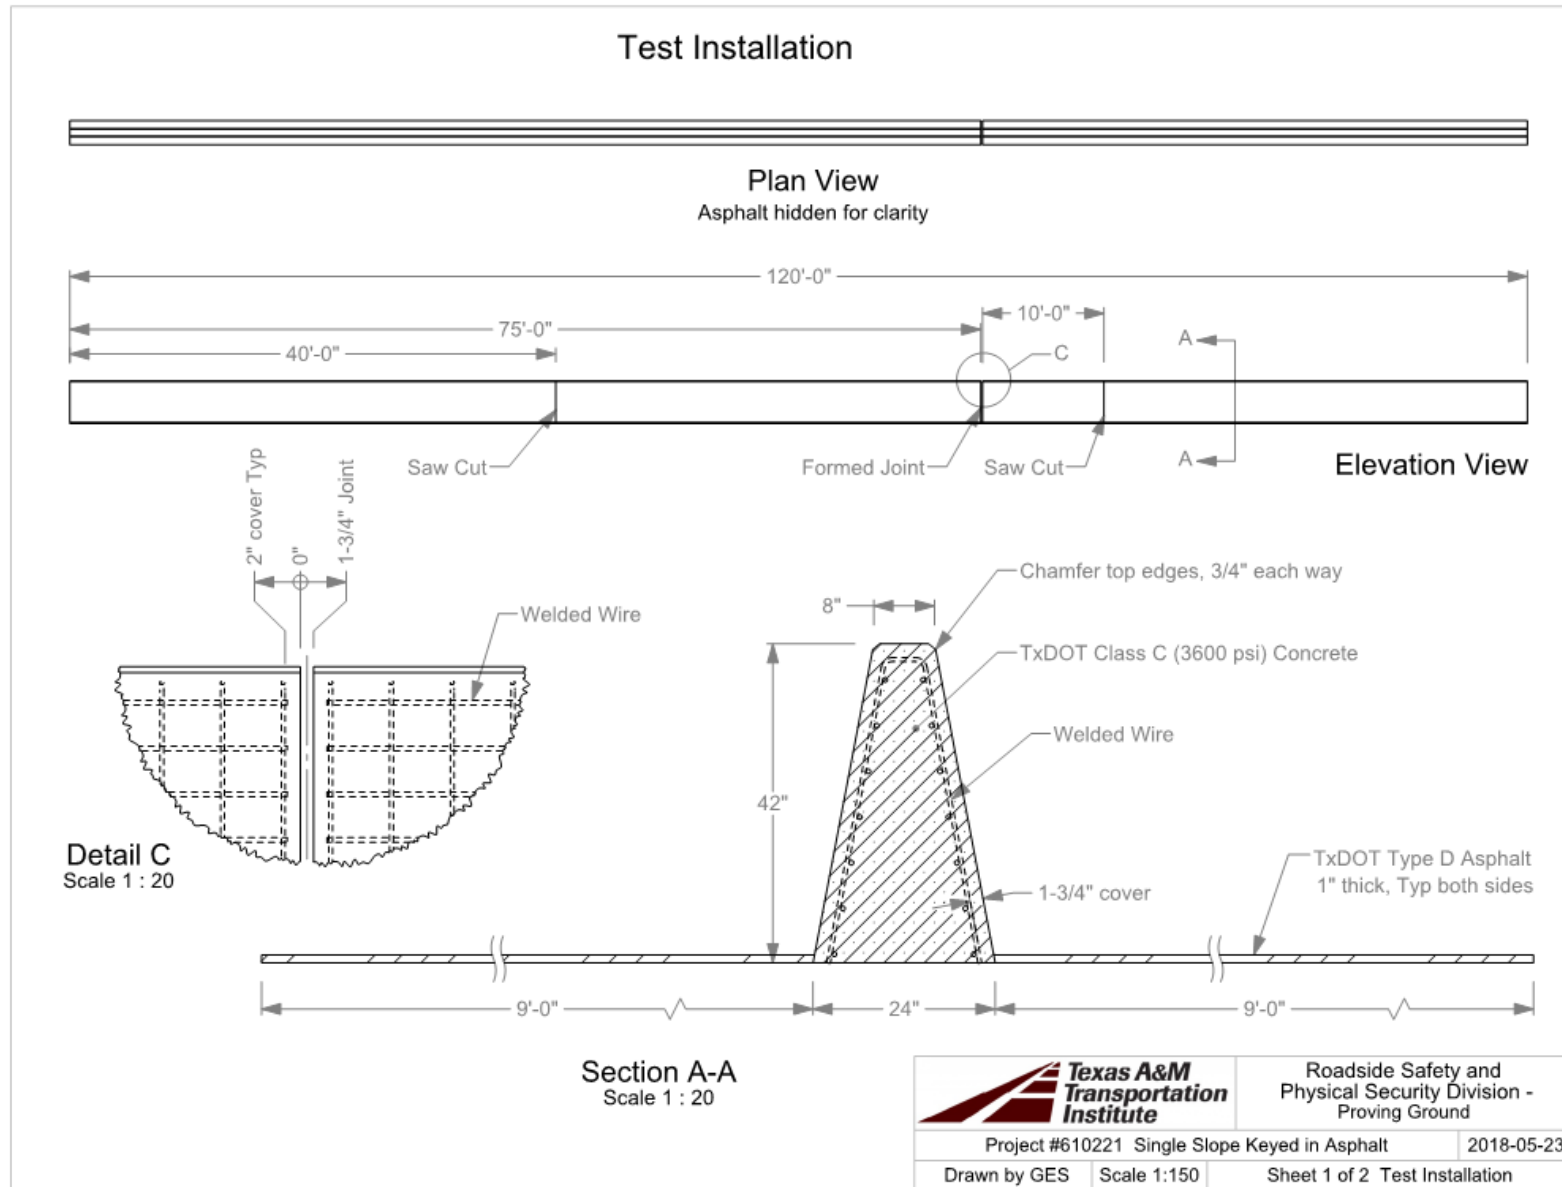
Details of the Keyed-In Single Slope Barrier.
